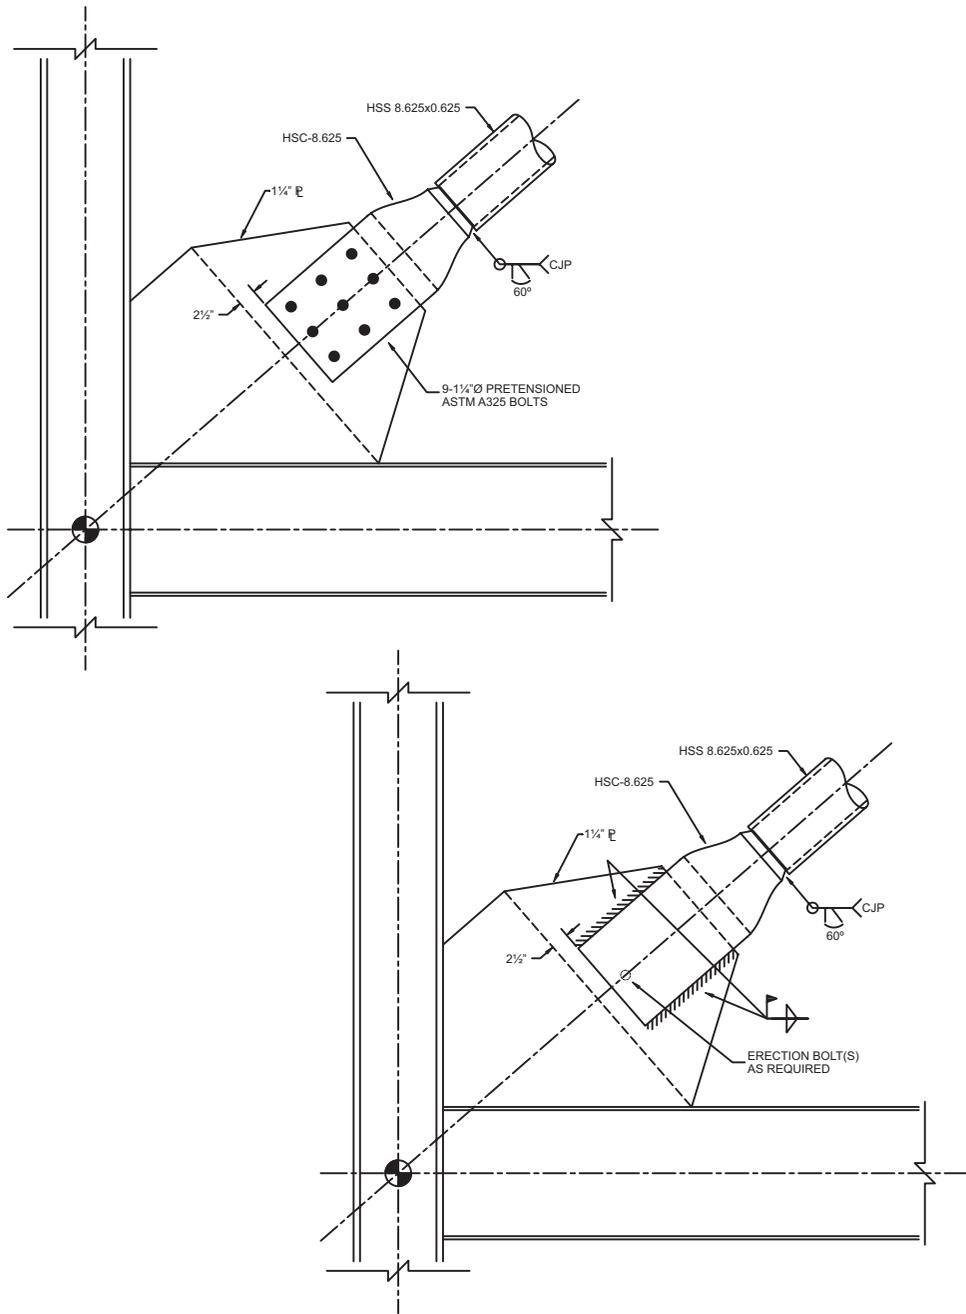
Field bolted (top) and field welded (bottom) brace connection configurations using High-Strength Connectors
